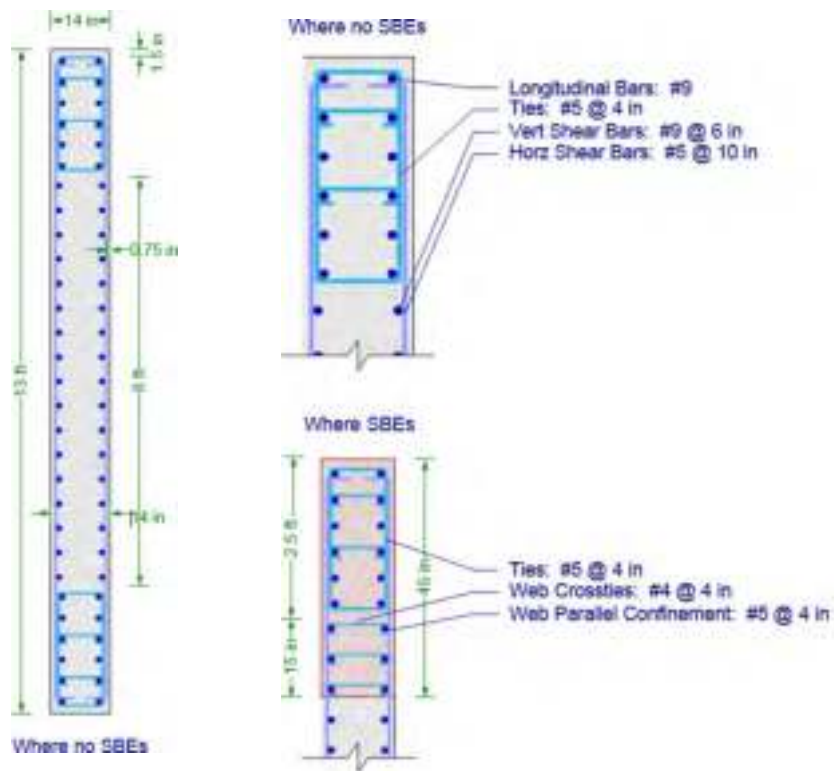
Building (B6-9S-M-S) Special RC Shear Reinforcement Details; Wall Section for Floors 1-3
